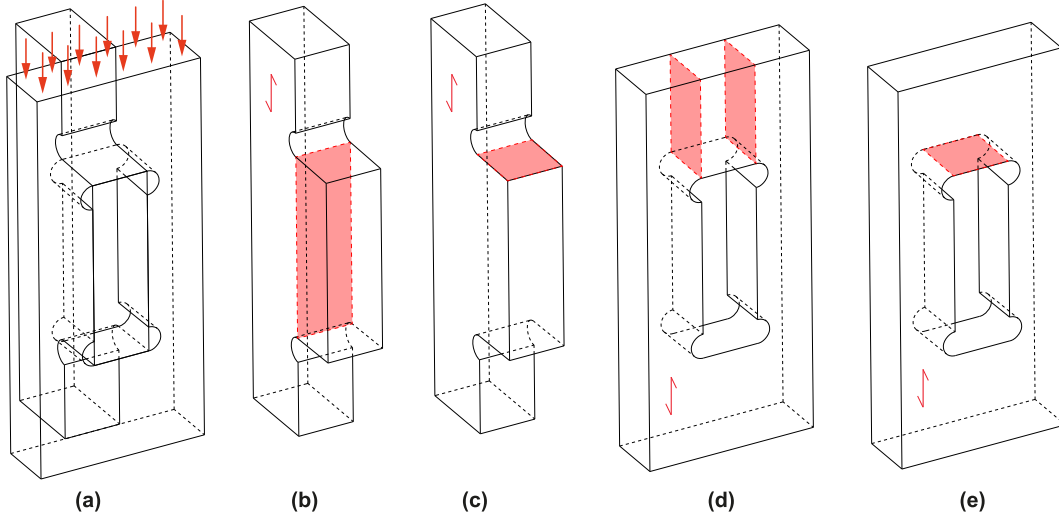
Possible failure modes of a TT connection: (a) Axonometry of a TT joint loaded in its length direction/ (b) Shear failure area in tenon part/ (c) Compression failure area in tenon part/ (d) Shear failure area in mortise part/ (e) Compression failure area in mortise part.
